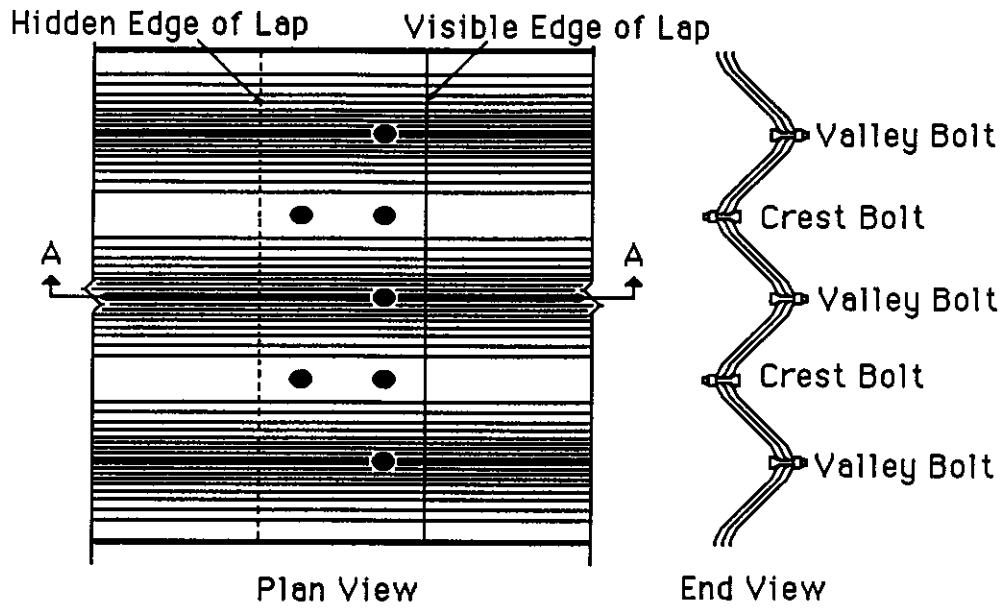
Bolting Arrangement for Specimen 7C3MC
